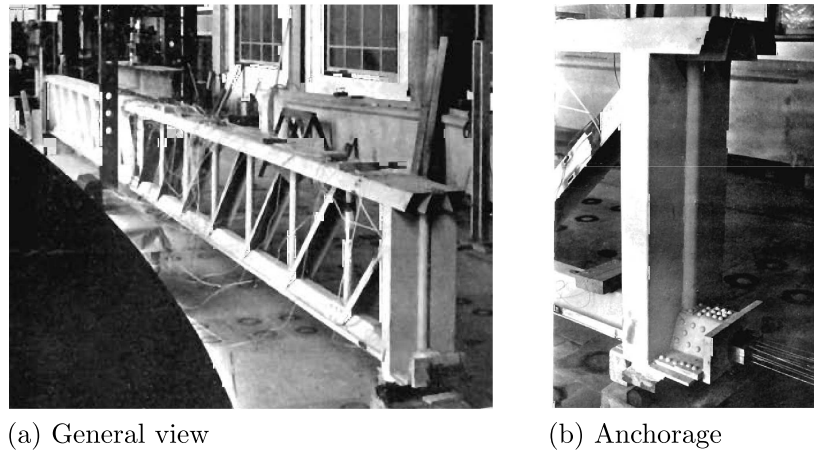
Prestressed trussed girder; the first experiment on prestressed steel structures by Magnel (1950).
